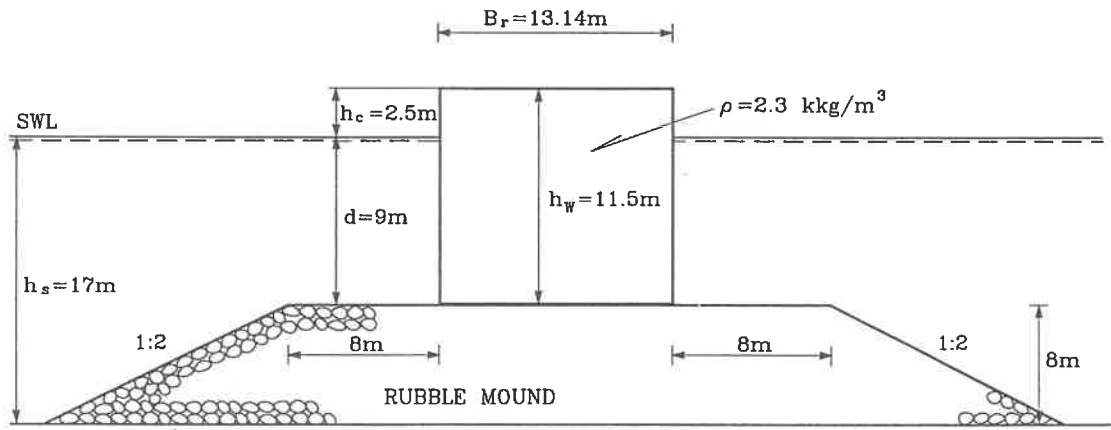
Deterministic design of a monolithic vertical wall structure on high rubble.
